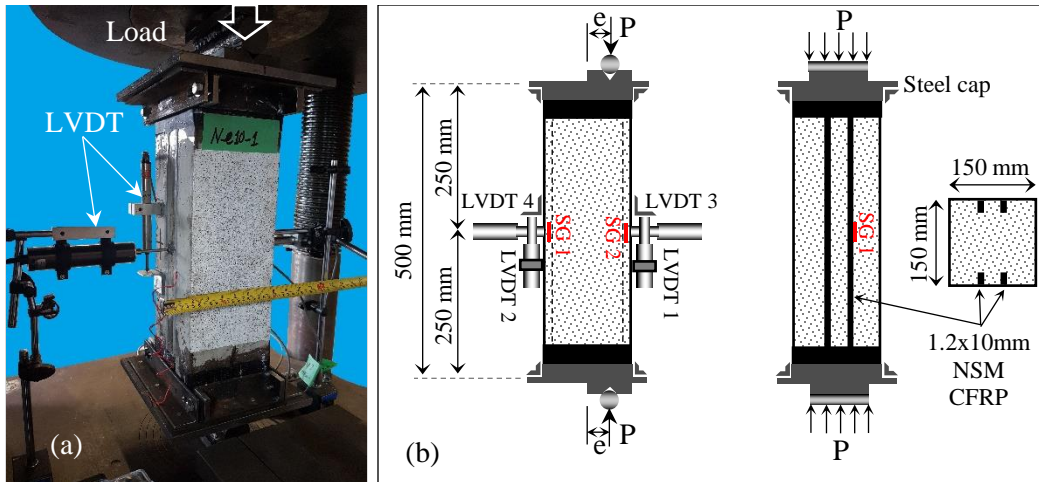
Test set up and instrumentation: (a) testing machine and instrumentation, and (b) schematic testing specimen and reinforcement layout.
